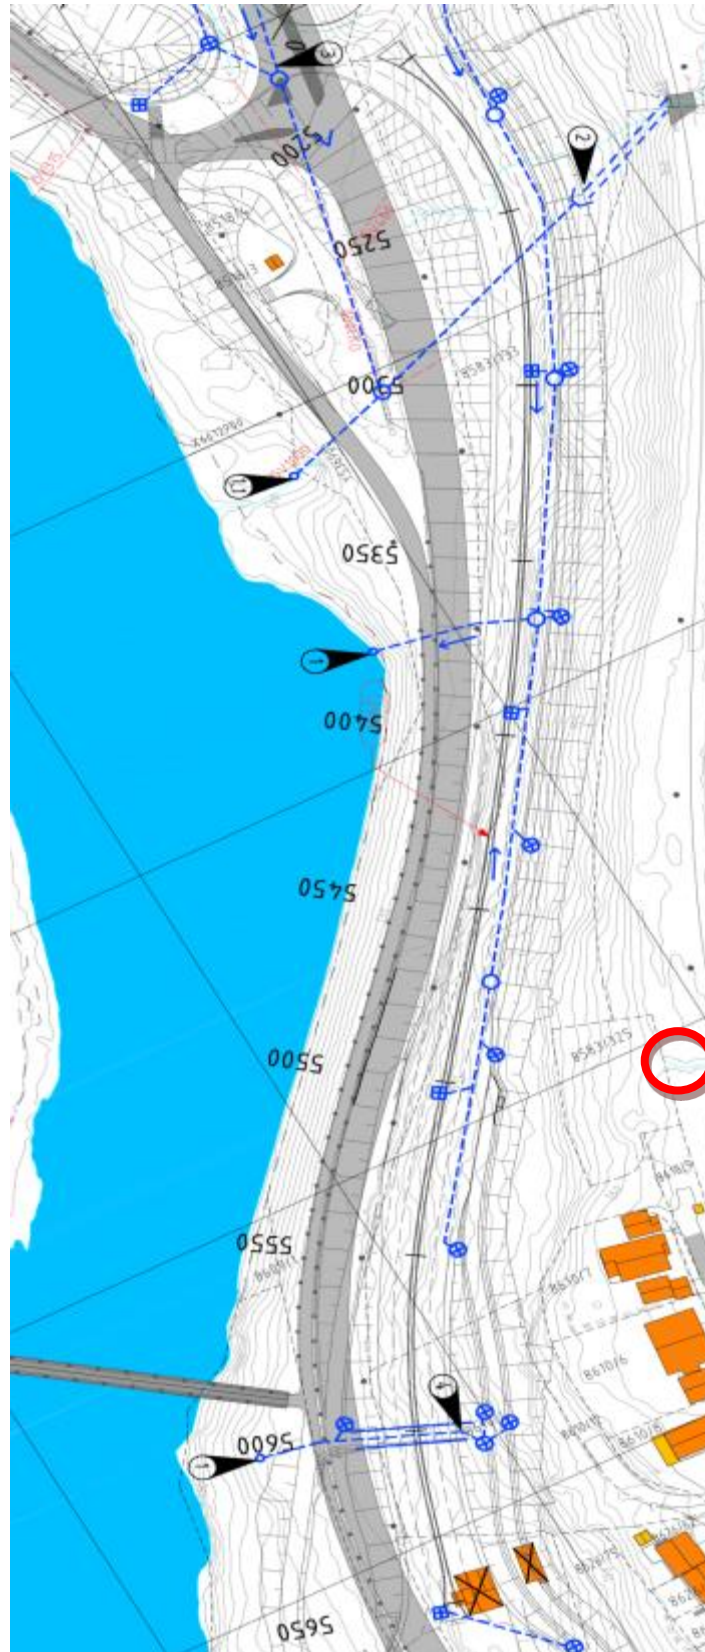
Overview of the proposed draining system in the case study area. Take note that the existing road is grey in the map, not the proposed road. Draining pipes are blue dashed lines, manholes are circles with a cross and drains are squares with a cross. There is a small creek under the red circle.
